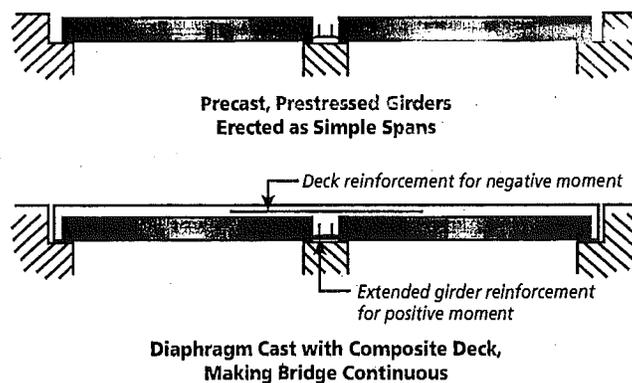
Example of Constructing Decks Continuous for Live Load (Rabbat and Aswad, 2002)
